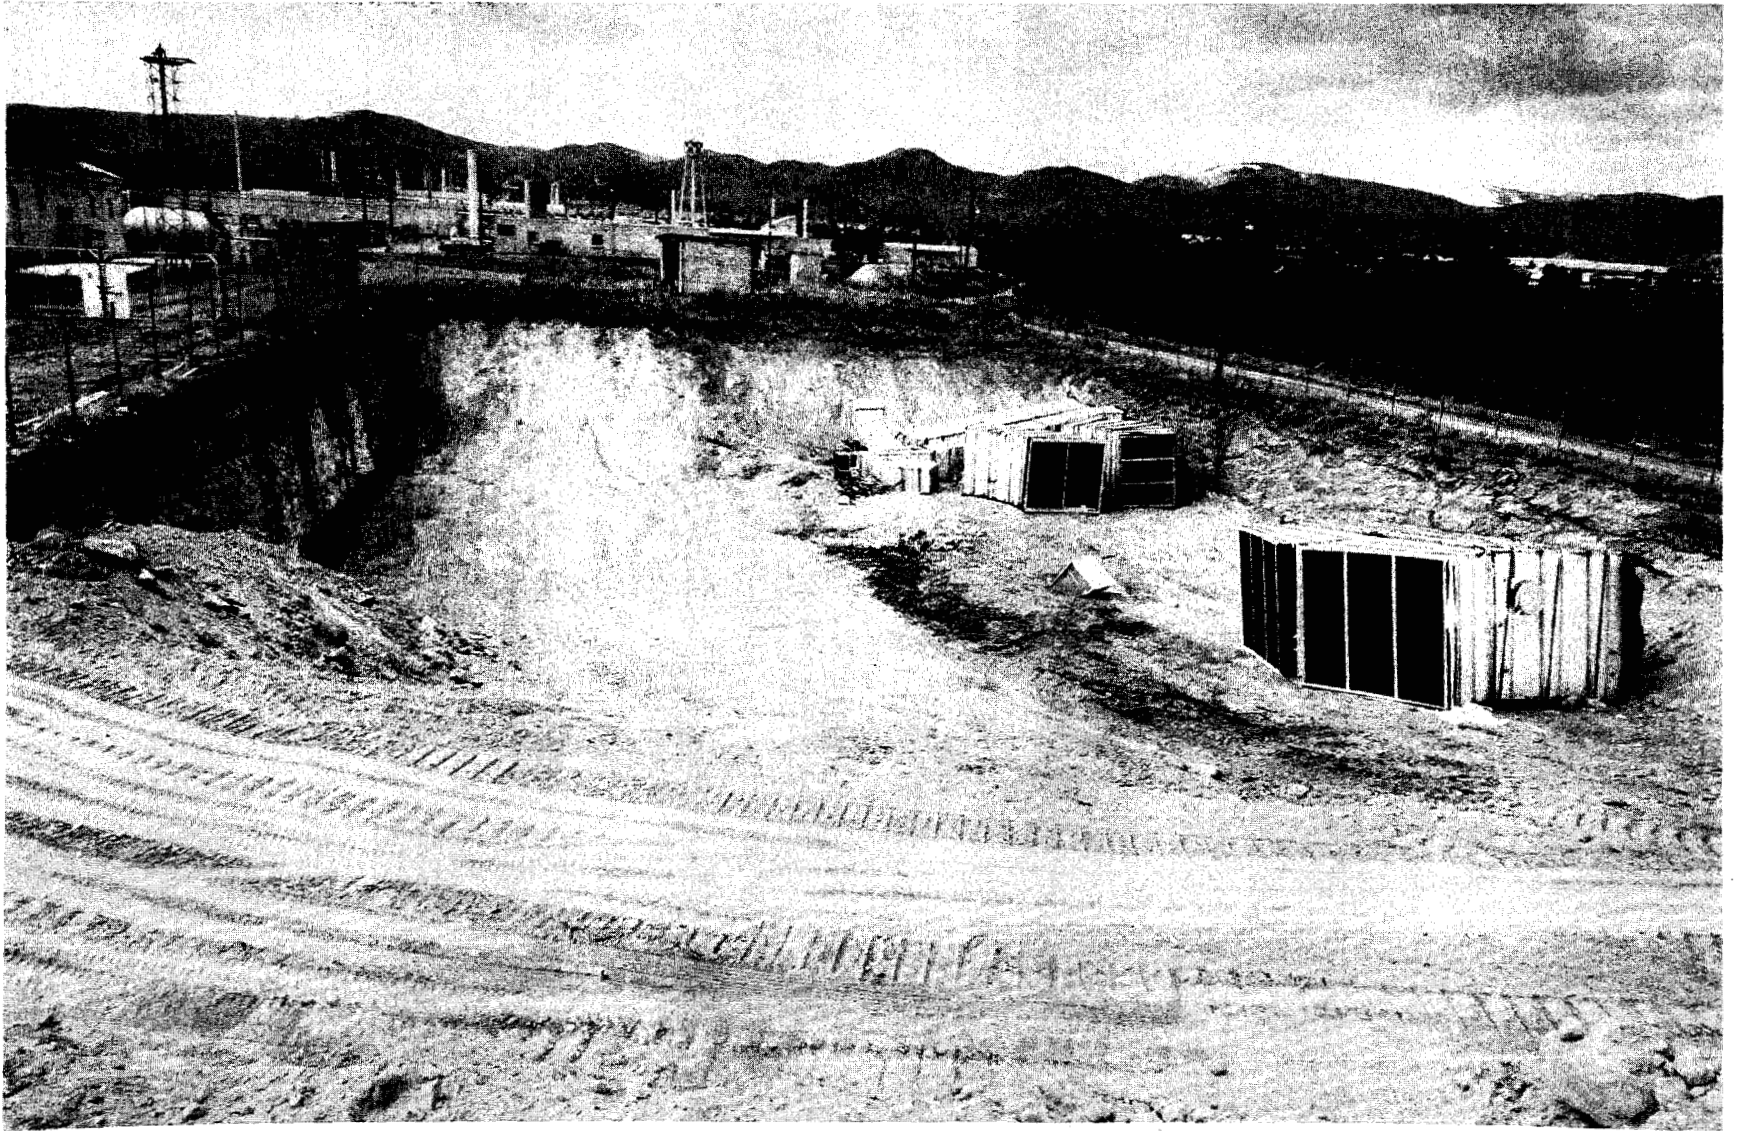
Photograph (1973) showing building demolition materials being buried in the pit.
